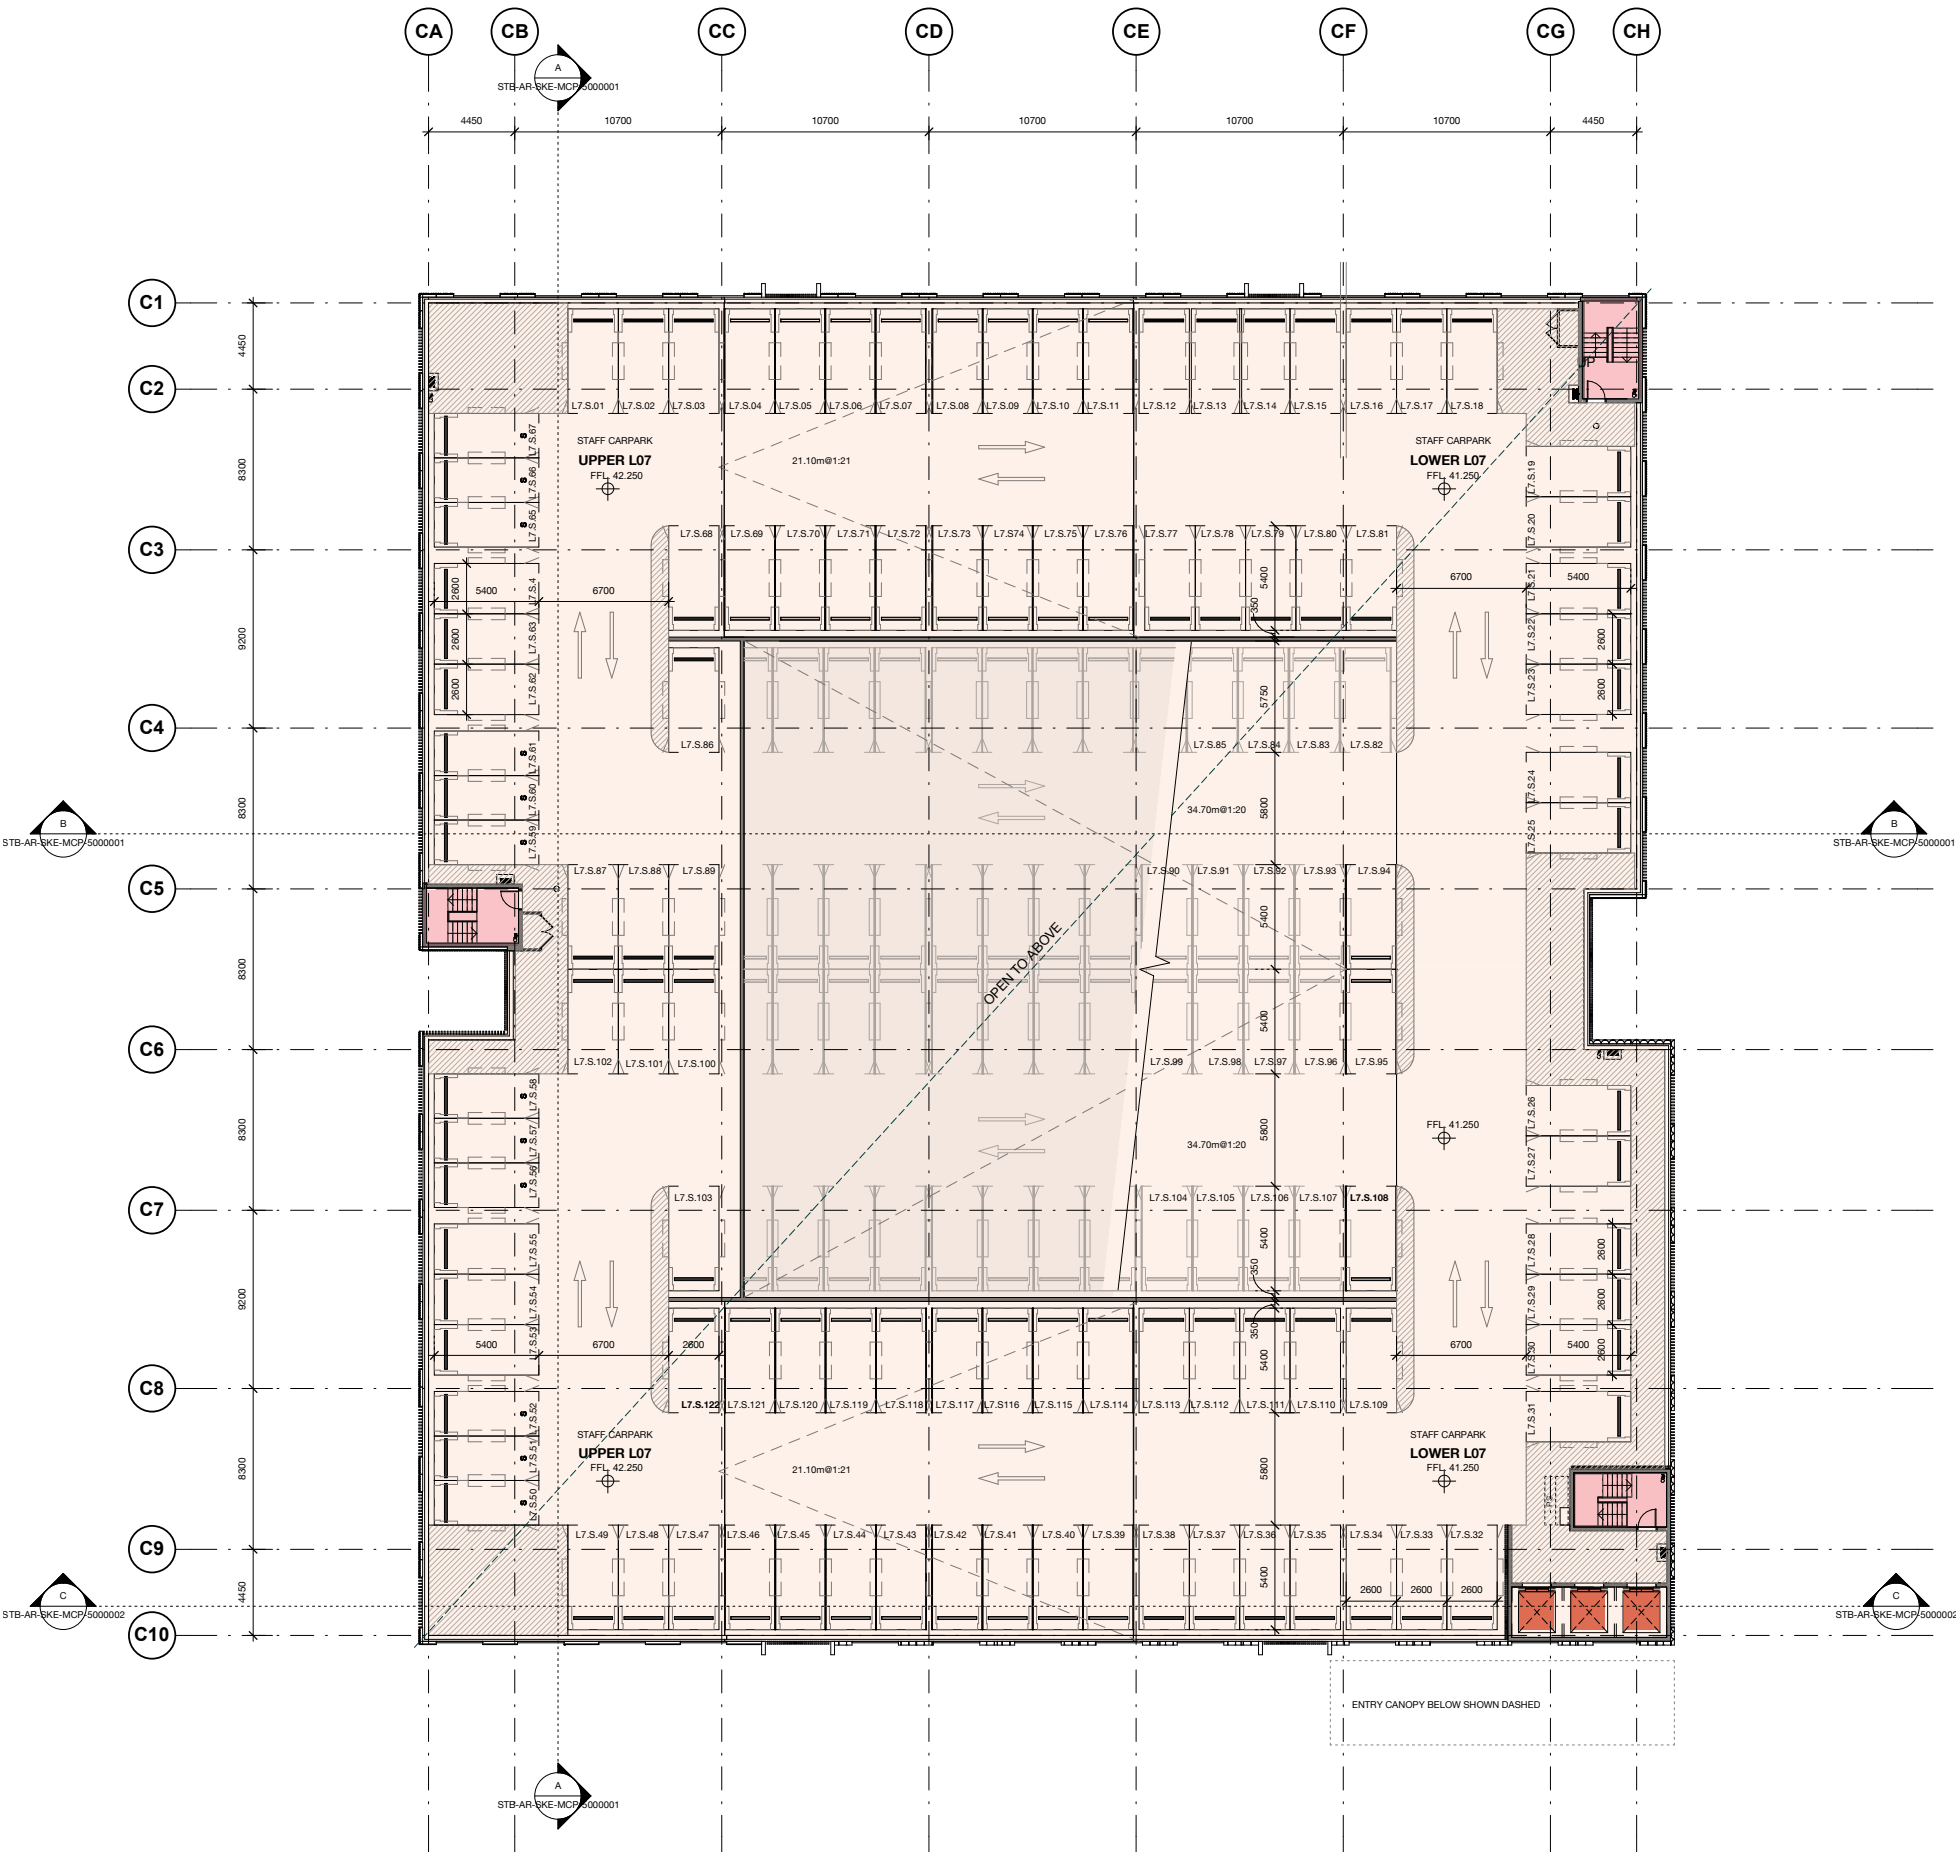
Multi-Deck Carpark, Floor Plan - Level 7
